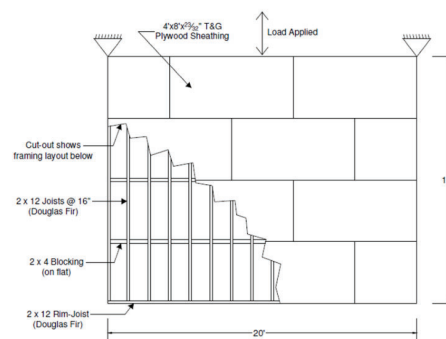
CUREE W-27 Test Details, Specimen 1 and 2 [3]
